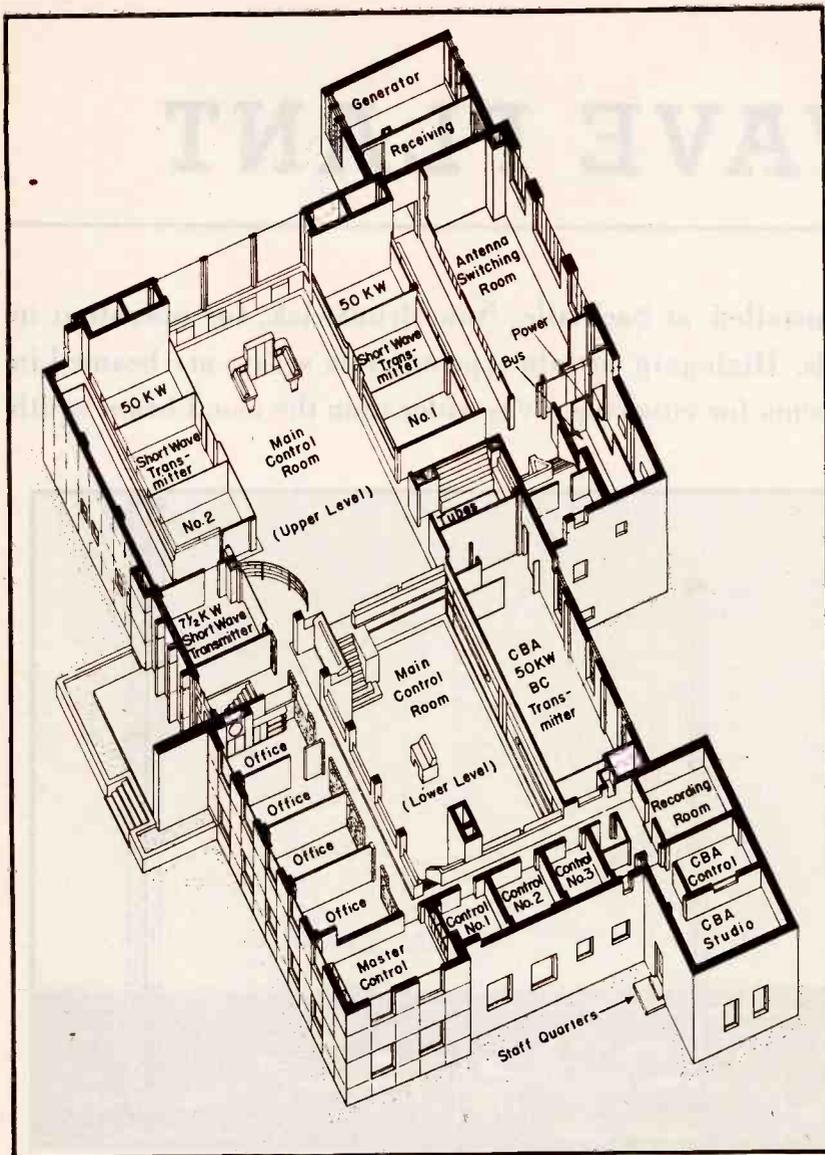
Isometric view of main floor of CBC short-wave building at Sackville
